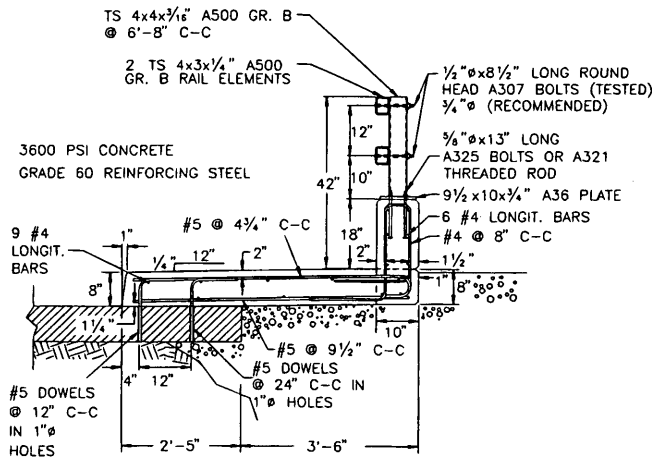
Cross section of BR27D bridge railing mounted on sidewalk.
